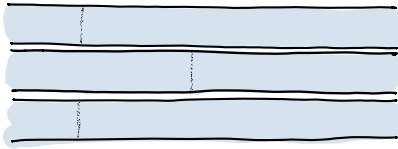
Detail heat bonded butt joint in a laminate assembly with redundancy principles applied by staggering the bonded joints
